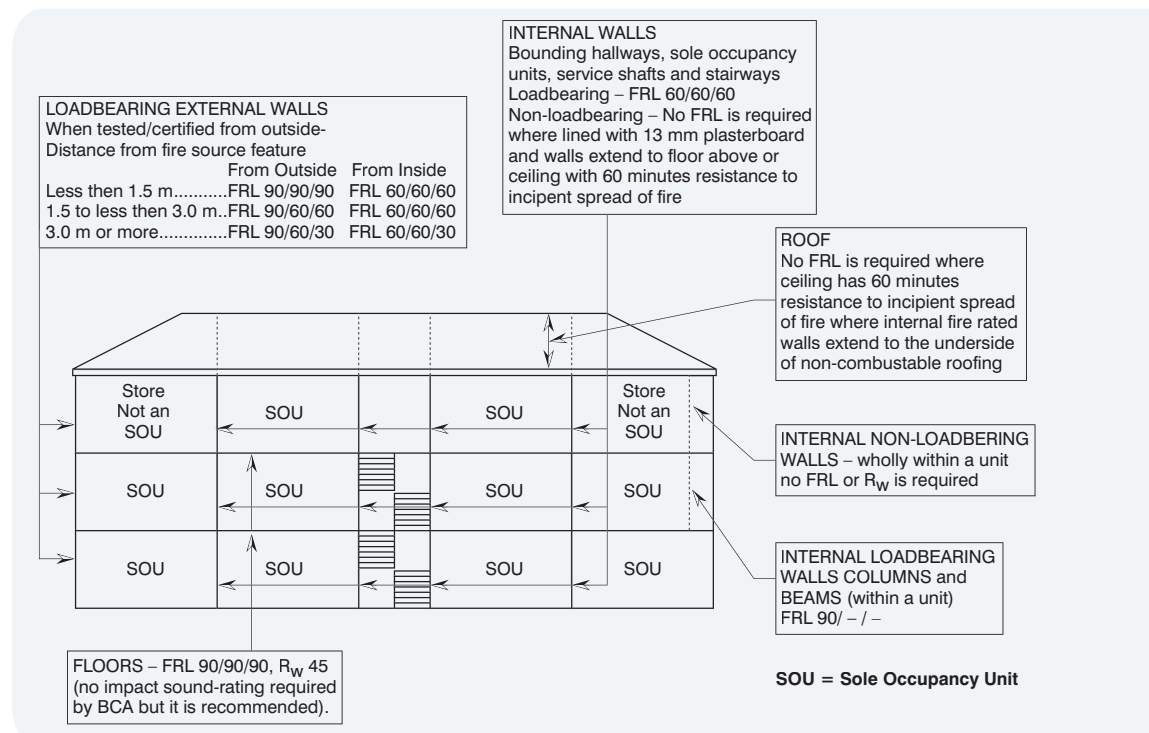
Type A Construction Deemed to Satisfy Requirements – with sprinklers and smoke alarms.
